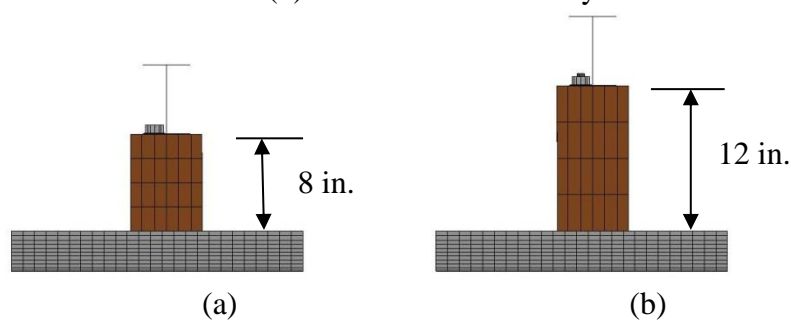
Blockout Depth Comparison for (a) Modified G4(1S) Guardrail and (b) Midwest Guardrail System
